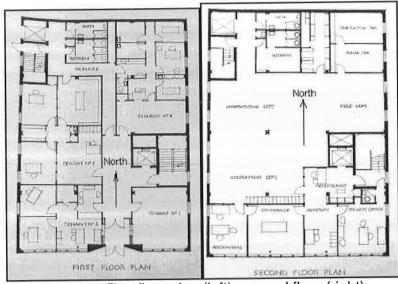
First floor plan (left), second floor (right) (Haynes and Griffith, architects, January 1950, in the possession of the building owner)
